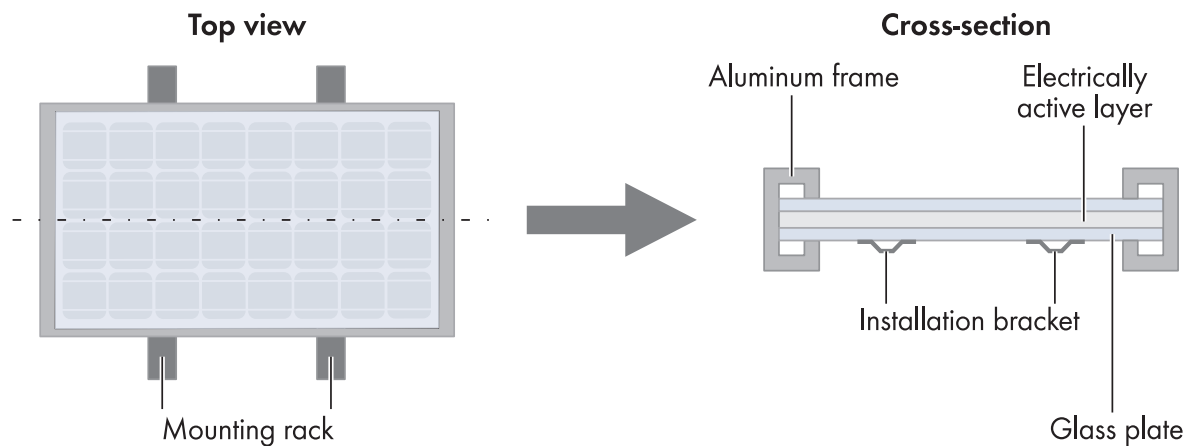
Plan view and cross-section of a PV module with a mounting frame.
